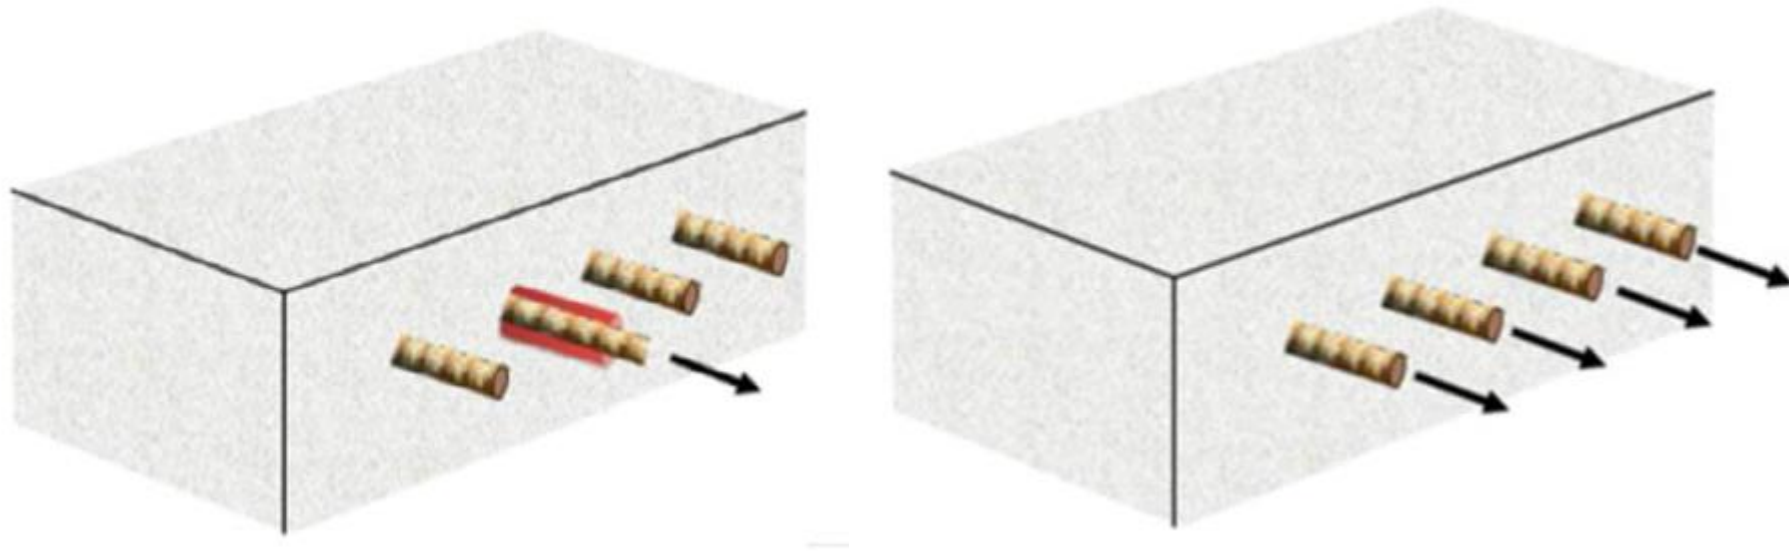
Example of Confined Tension Test Setup – Adhesive Anchor Shown
